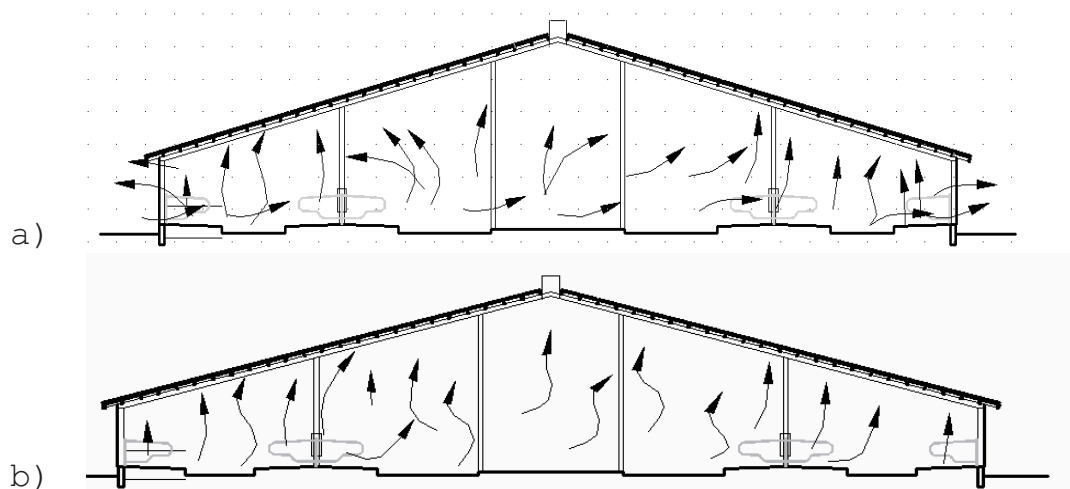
Air moving schemes: a) insulated roof; b) metal sheet roof.
